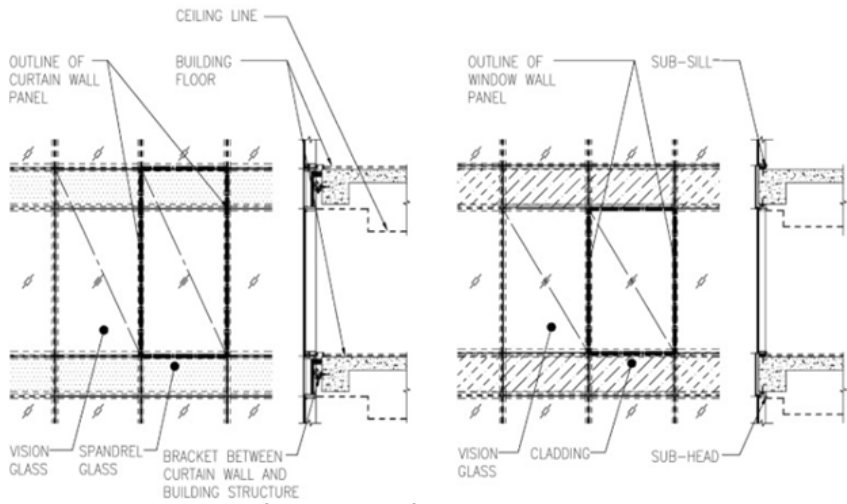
Outline in case of a curtain wall (left) and a window wall (right) (Lee, Shepherd, Evernden, & Meltcafe, 2017)
